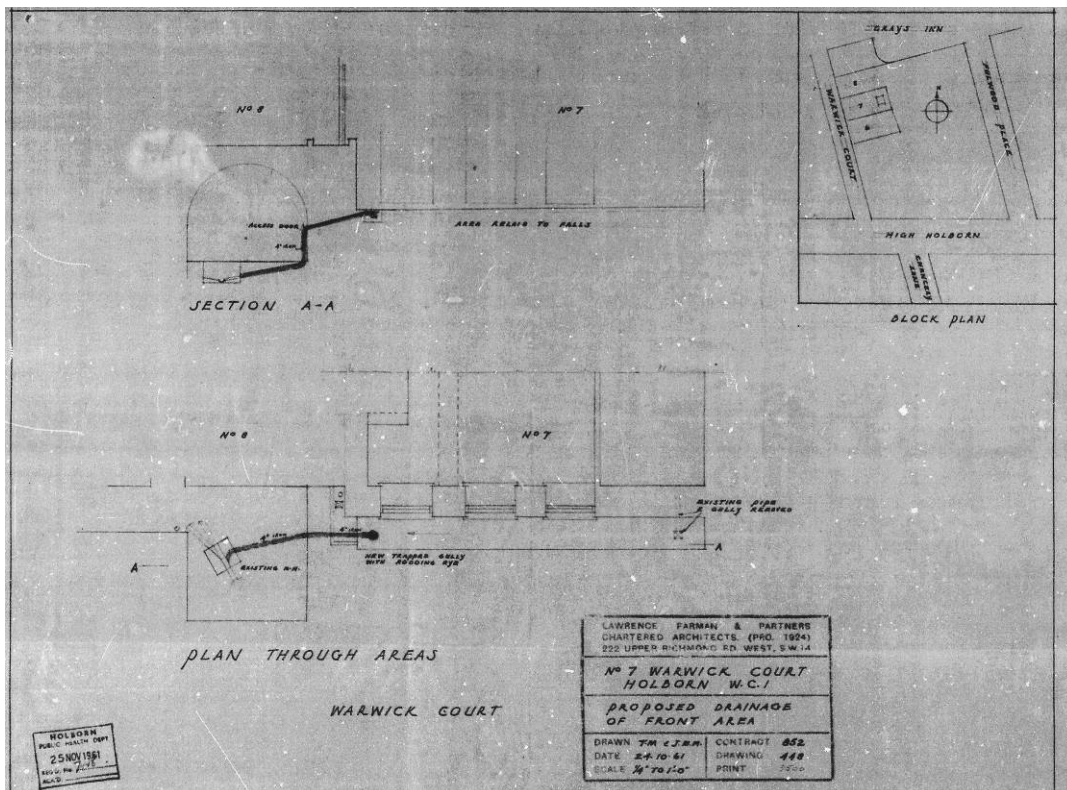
Drainage plan of 1961, Lawrence Farman & Partners, 1961
